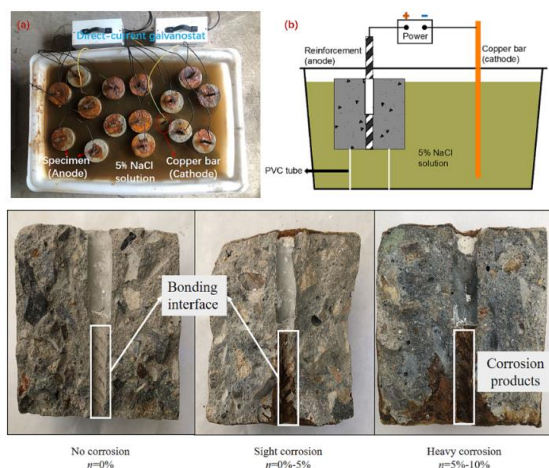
Laboratory tests of accelerated corrosion of rebar in corrosive environments along with the fracture cross-section
